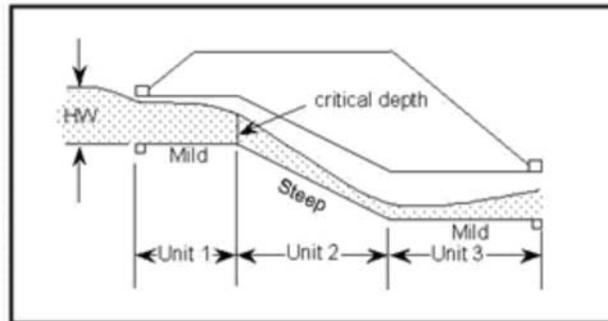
A - Three Unit Broken Back Culvert
